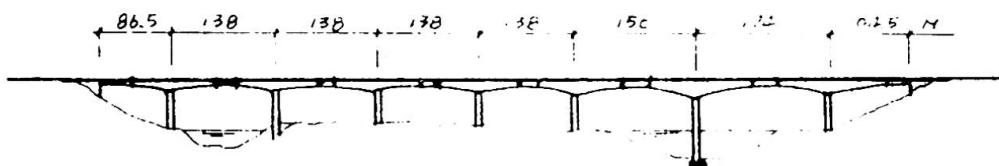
ELEVATION OF CHANGJIANG BRIDGE
